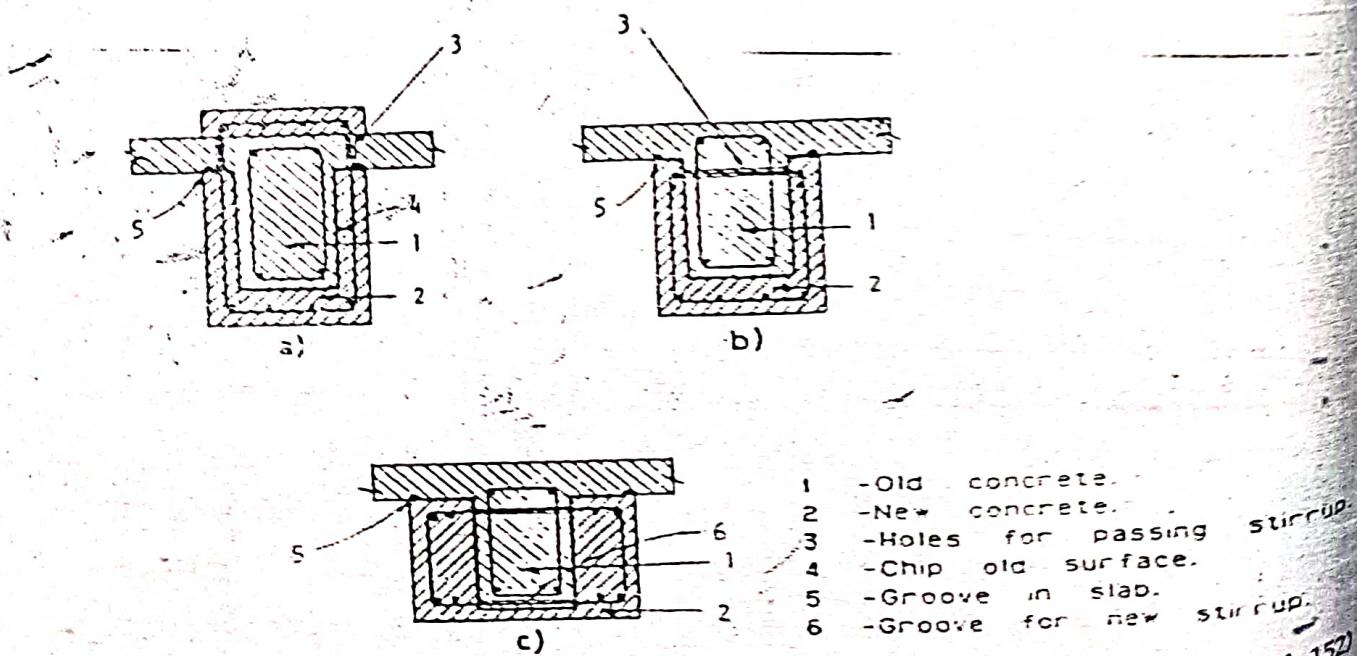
Increasing the section and reinforcement of existing beams (after Bibl. 152)
